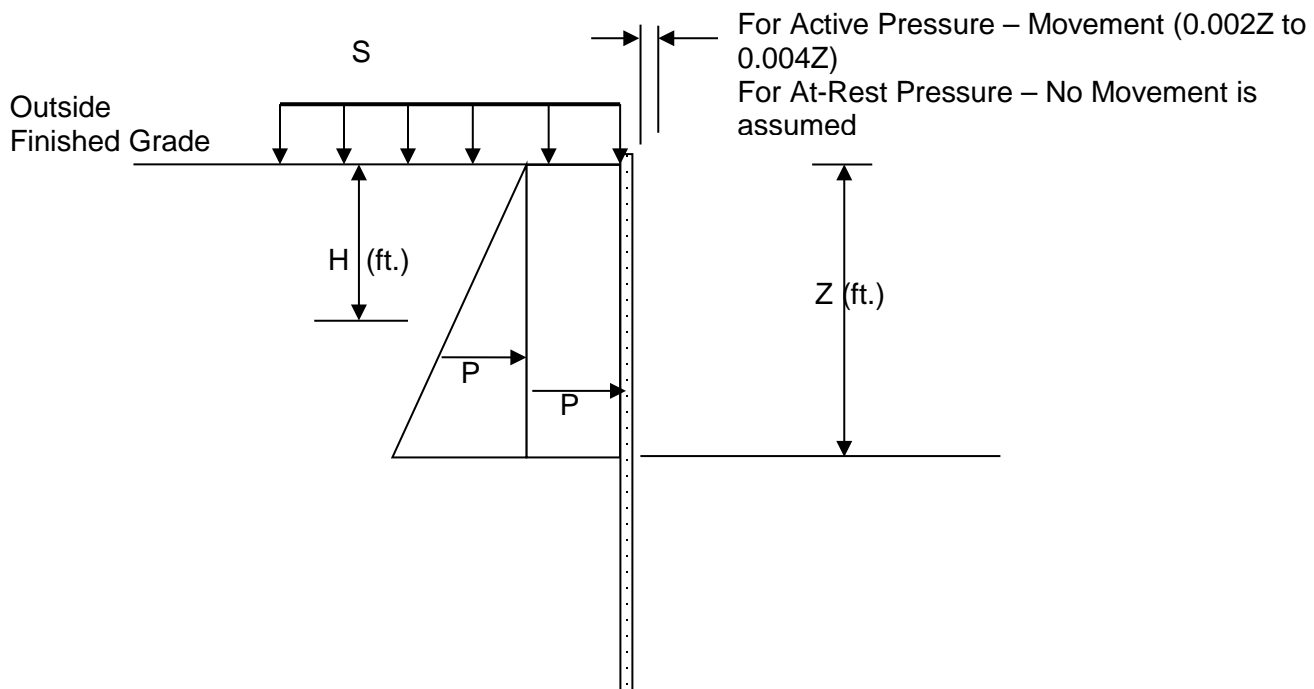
, Generic Vertical Cantilever Retaining Wall Schematic
